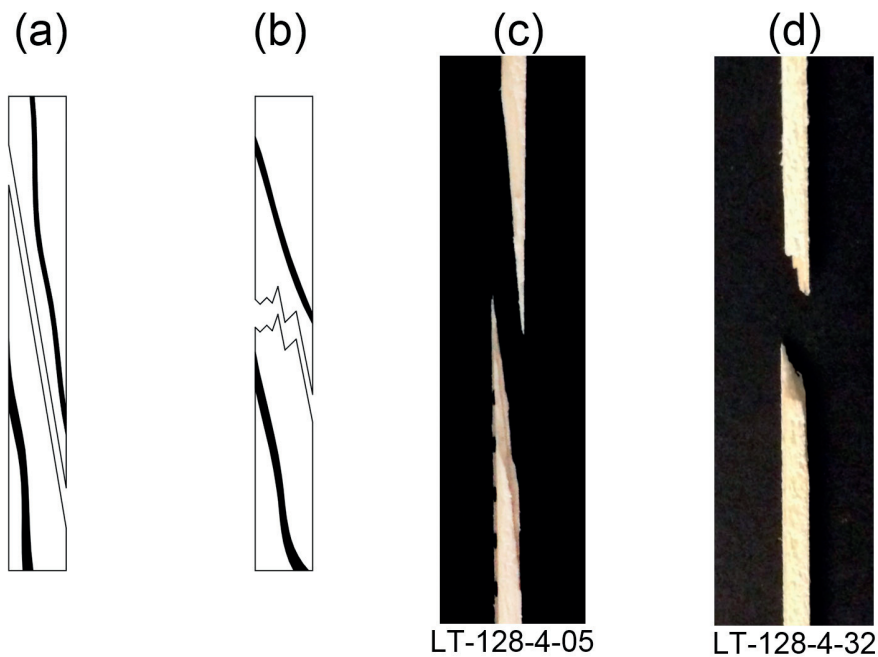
a and b) Schematic illustration of two failure modes; c and d) Typical specimen failures.
